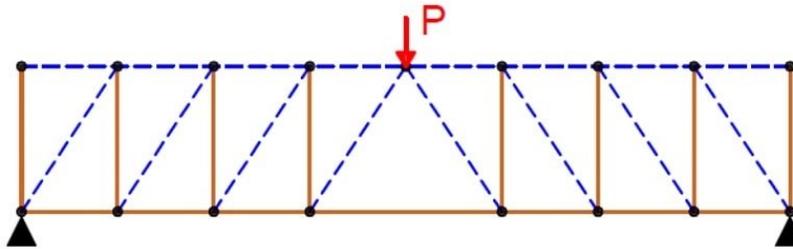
Strut and tie model for a bi-supported beam with centered force applied to the upper face
